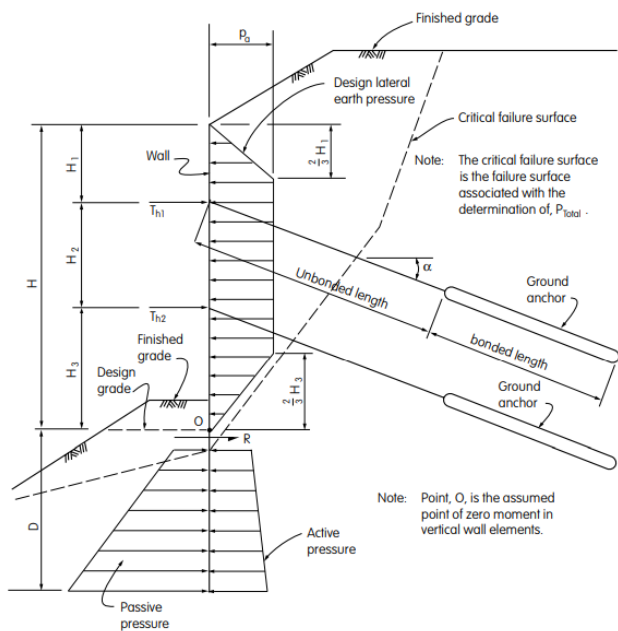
Anchored Wall with Multiple Levels of Ground Anchors and Critical Failure Surfaces
